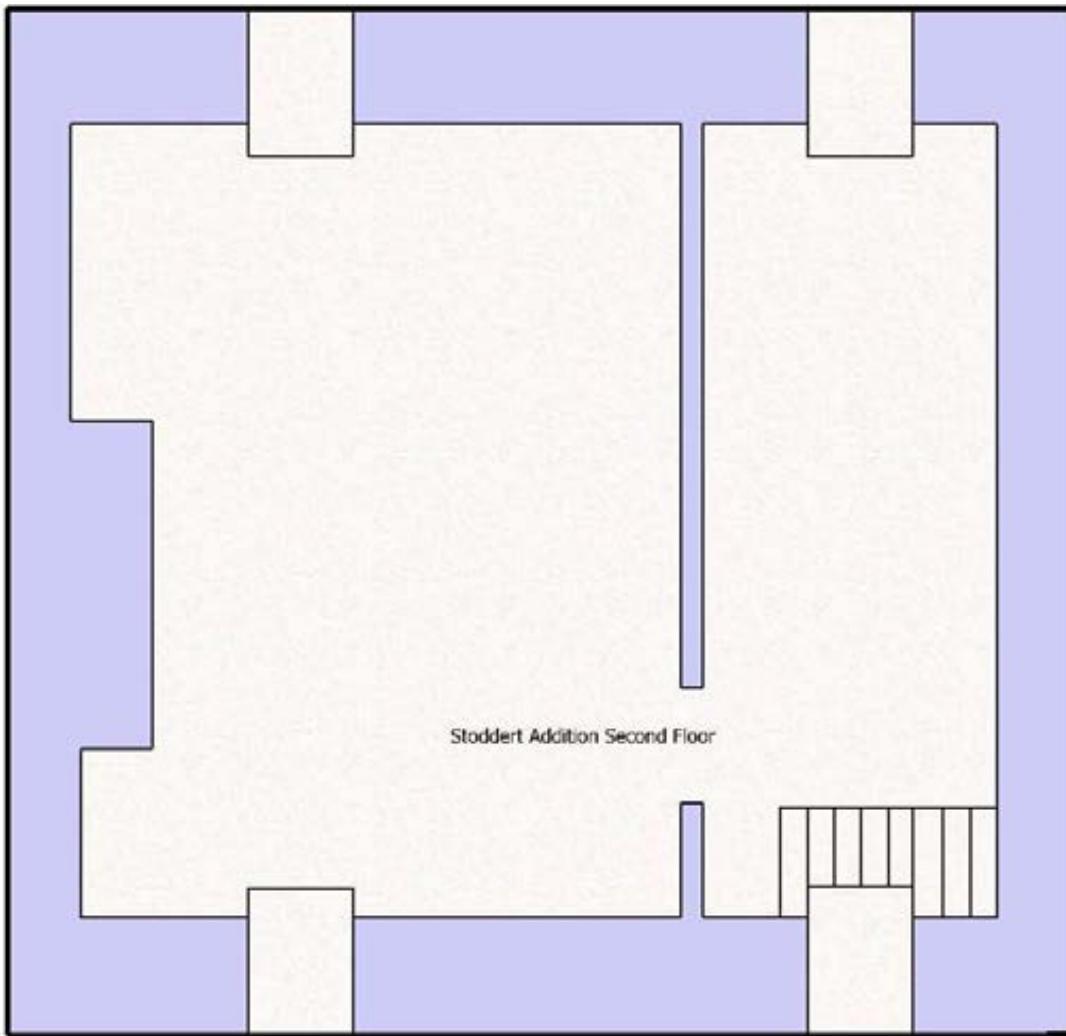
Plan showing the second floor of the Stoddert addition. Drawing by Kathleen Manicke.
